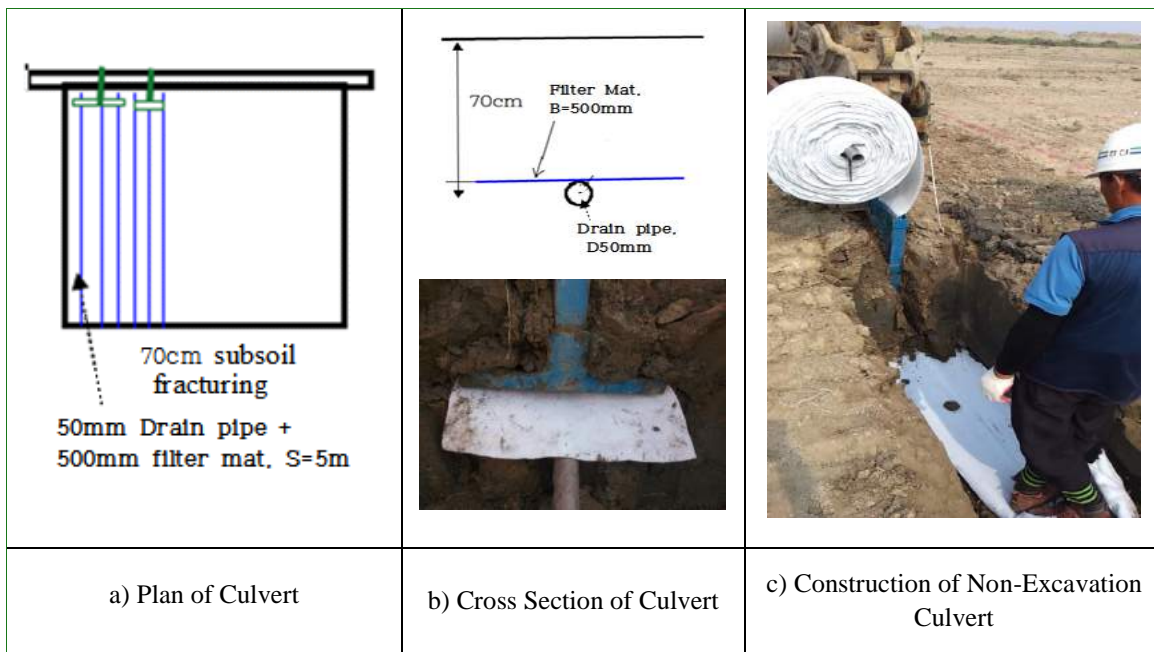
Test Construction of Subsurface Irrigation and Drainage Using Non-Excavation Single Pipe Method
